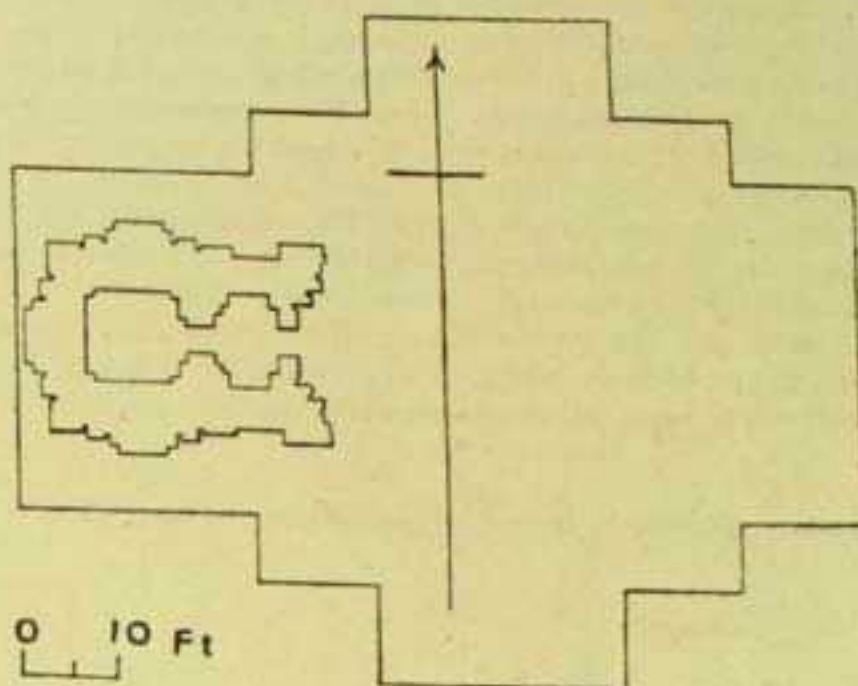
Ground Plan of the Indralath (after J. D. Beglar's drawing)
